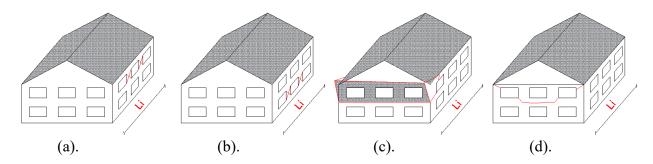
(a) Failure mechanism of Storey shear located on Upper storey, (b) Failure mechanisms related to Storey shear, (c) the failure mechanisms of whole wall overturning, (d) the failure mechanisms related to partial wall overturning.
